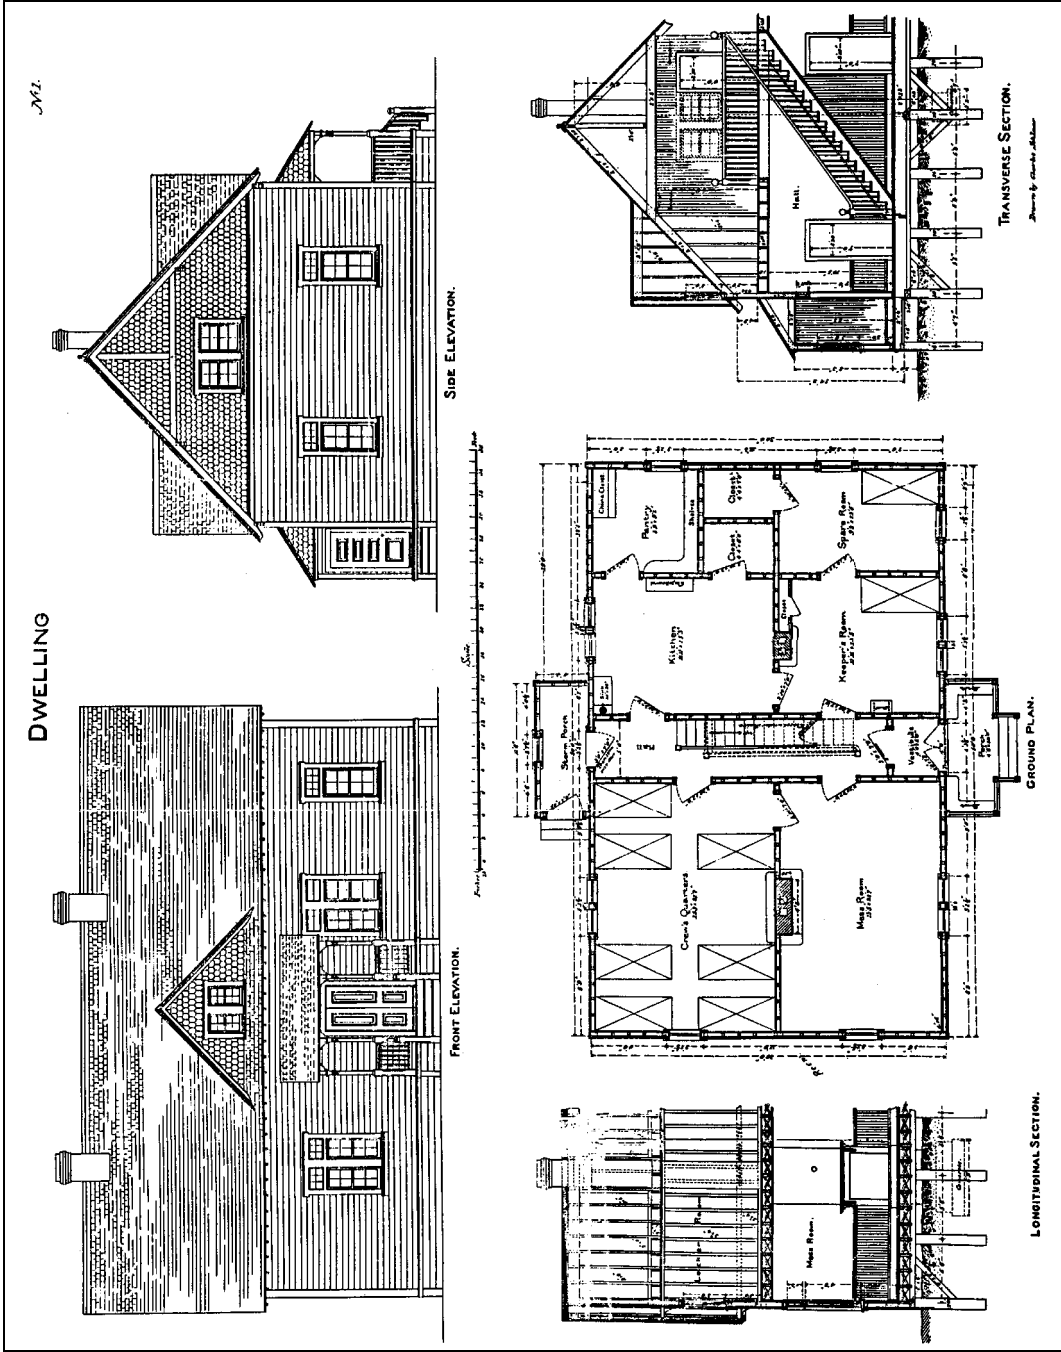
Marquette-Type Dwelling Plans. Source: Wick York.
